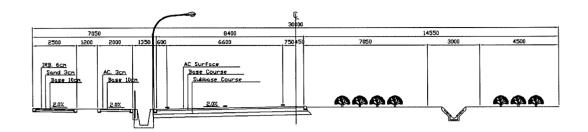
Typical Cross Section for Circumferential Road Segment (for ML3/6/7)
